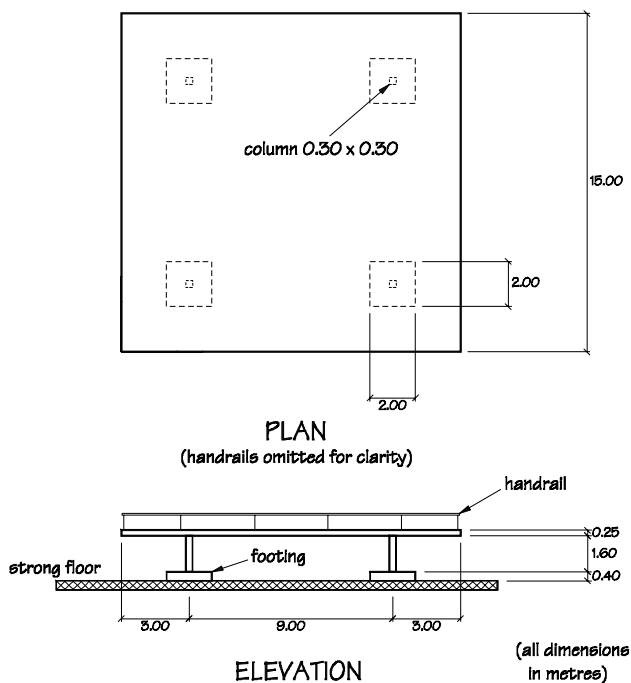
Layout of classically reinforced in situ cast HSC floor.
